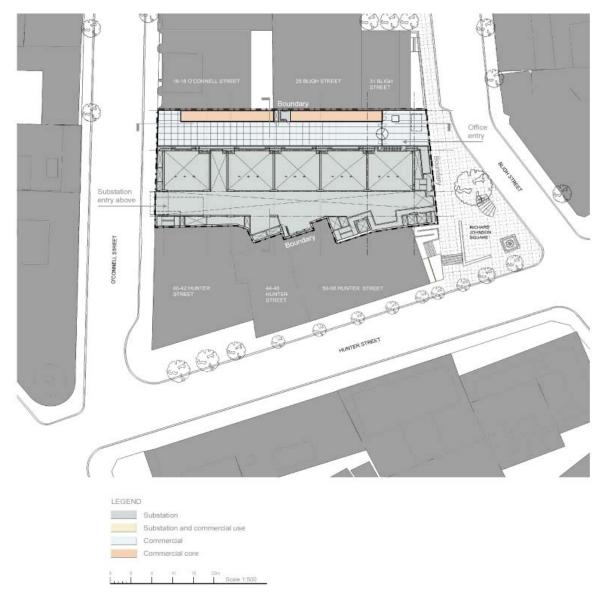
Conceptual floor plan for the commercial tower levels 14 – 22
